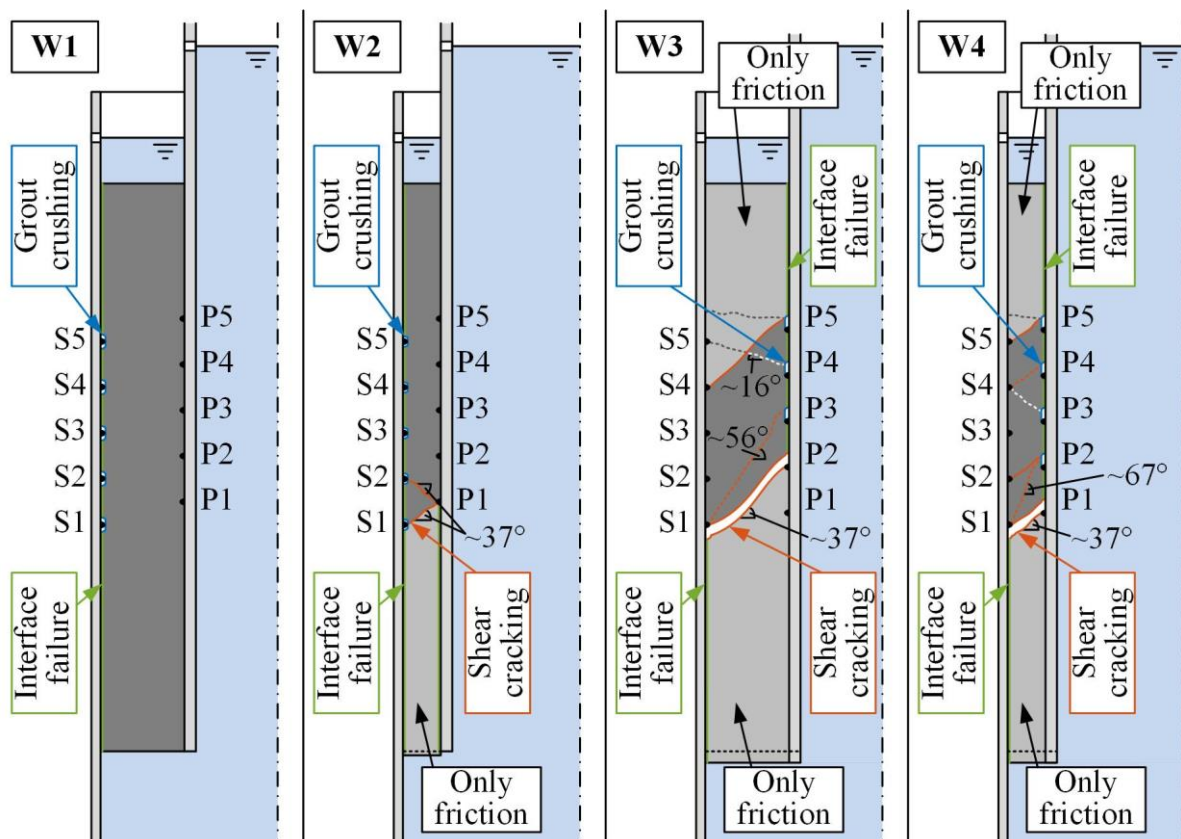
Overview of damage modes found in the grout layers of the specimens
